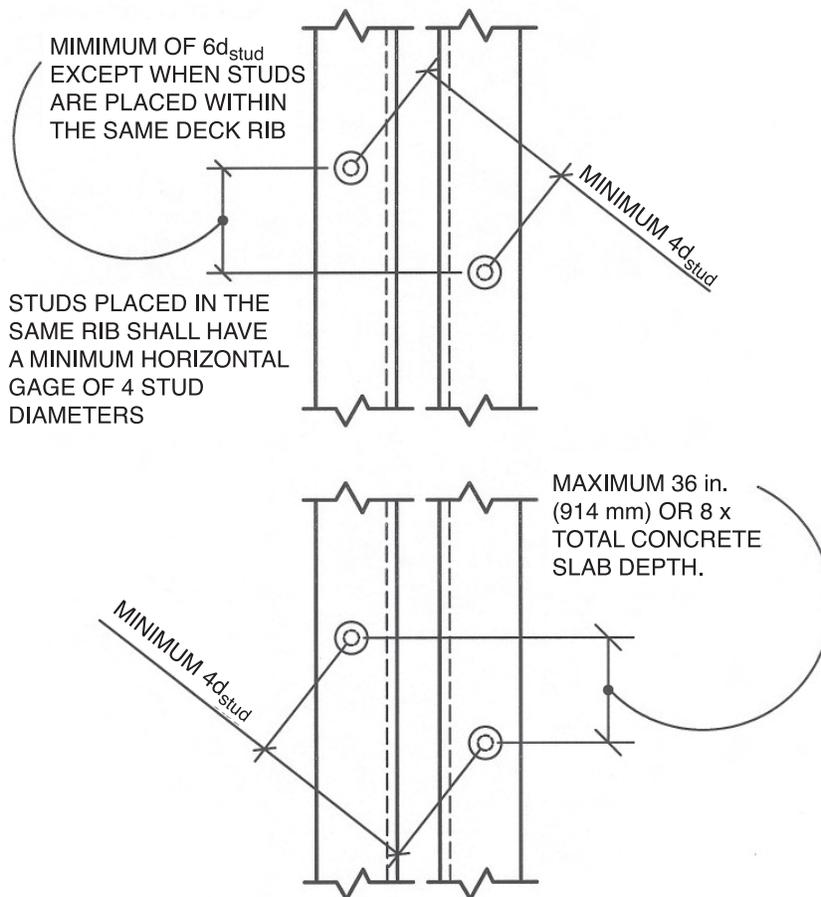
MINIMUM AND MAXIMUM LONGITUDINAL SHEAR STUD SPACING
